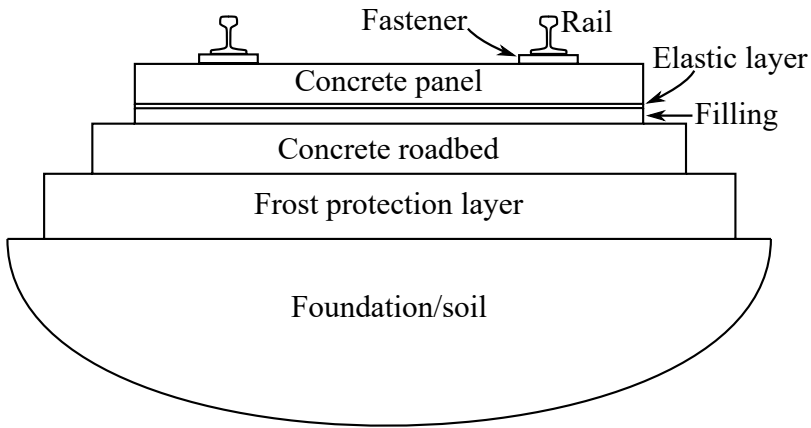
Schematic cross-section of a prefabricated slab track system.
